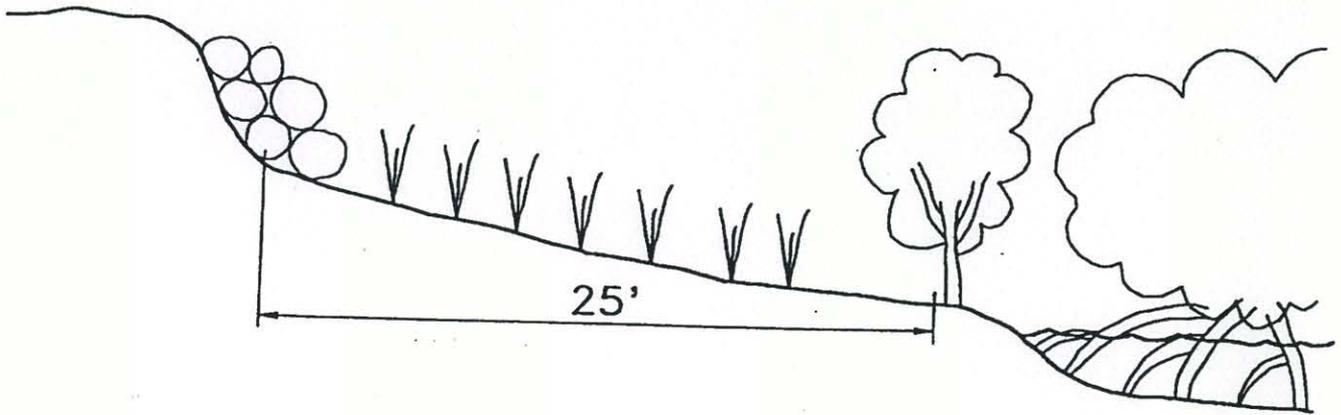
Typical grading and planting plan for roadway (south side) shoreline buffer at Enchanted Island.
